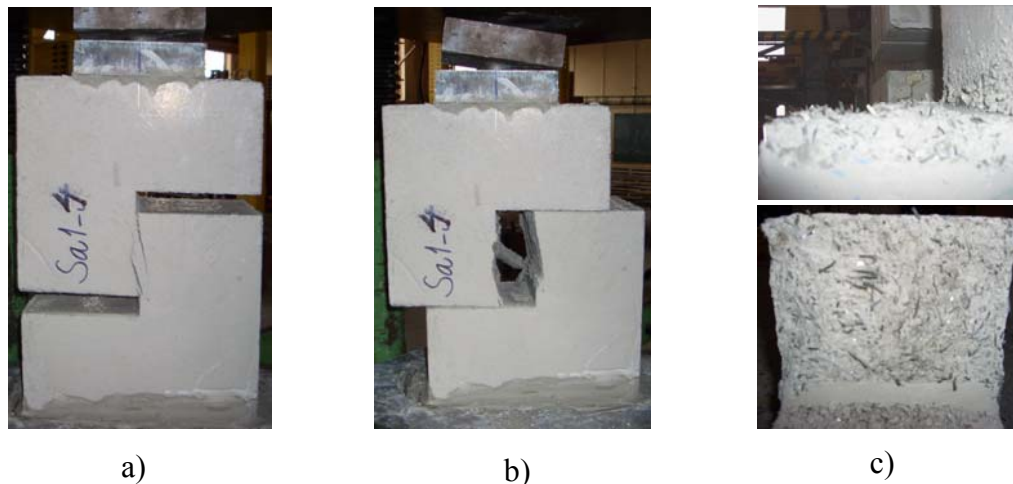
Specimen shear failure: a) shear crack initiation, b) collapse of specimen, c) failure surfaces
